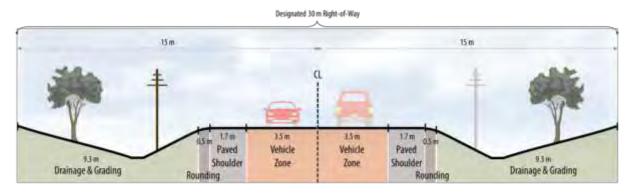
11.4 m Platform Rural Cross-Section for Bush Street
